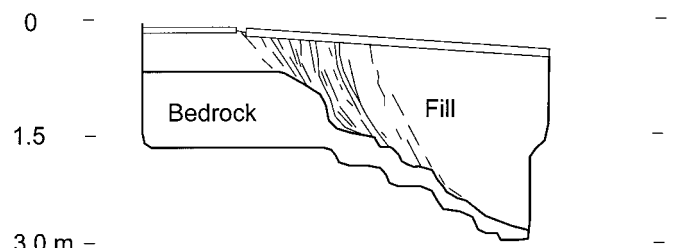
Trench Log Showing Cracking Pattern near Cut/Fill Contact—Cracking Extends to Depth of about 2 m (Adapted from Seward, Confidential Geologic Report, 1994)
